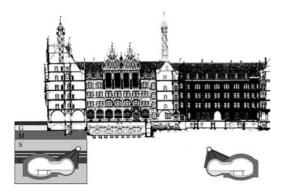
Cross section with City Hall, tunnels and geologic situation.
